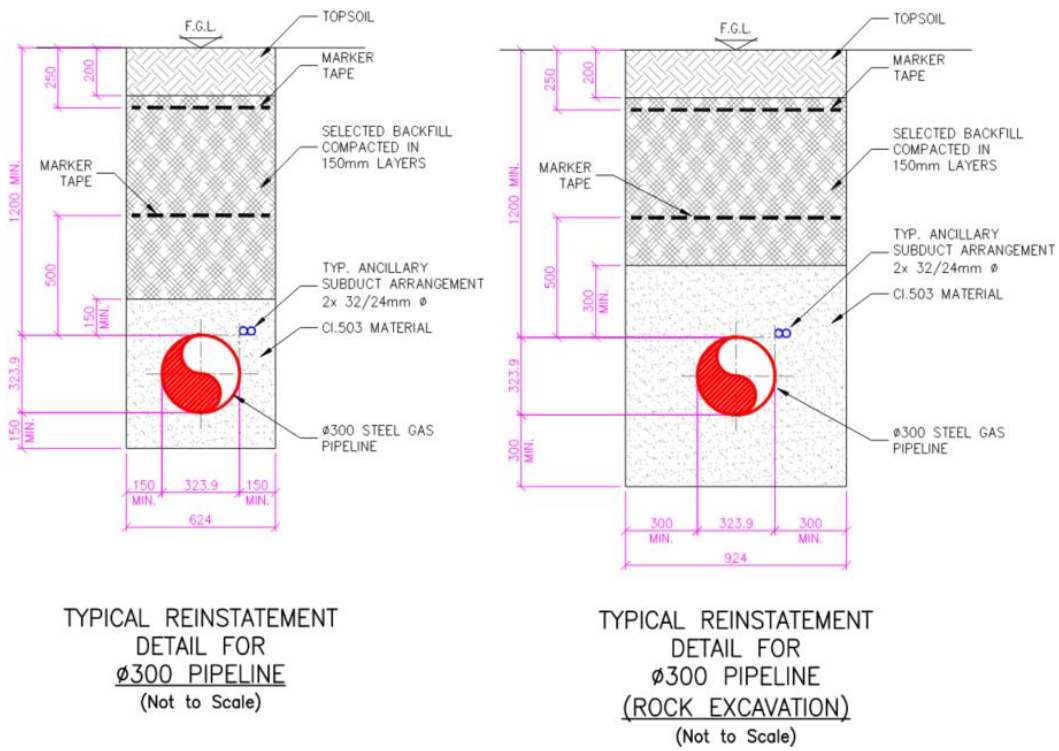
Example Cross Section of Reinstated Trench Showing Pipe, CL.503 Material, Subsoil, Marker Tape and Topsoil
